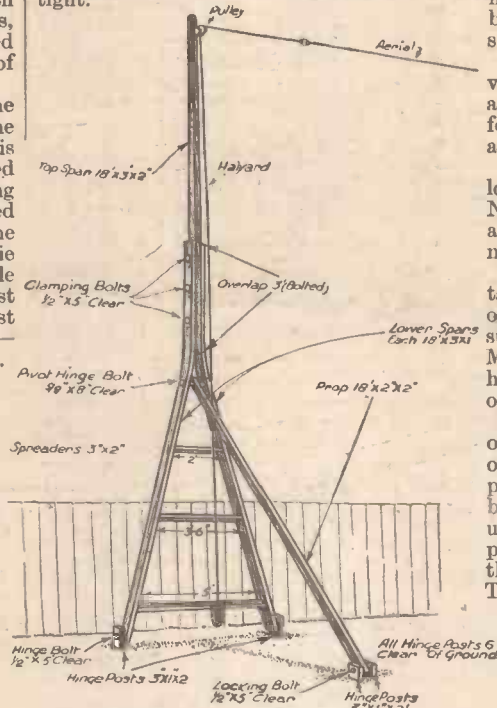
Showing constructional details of the mast and how it can be placed close to fence or wall in short garden.
